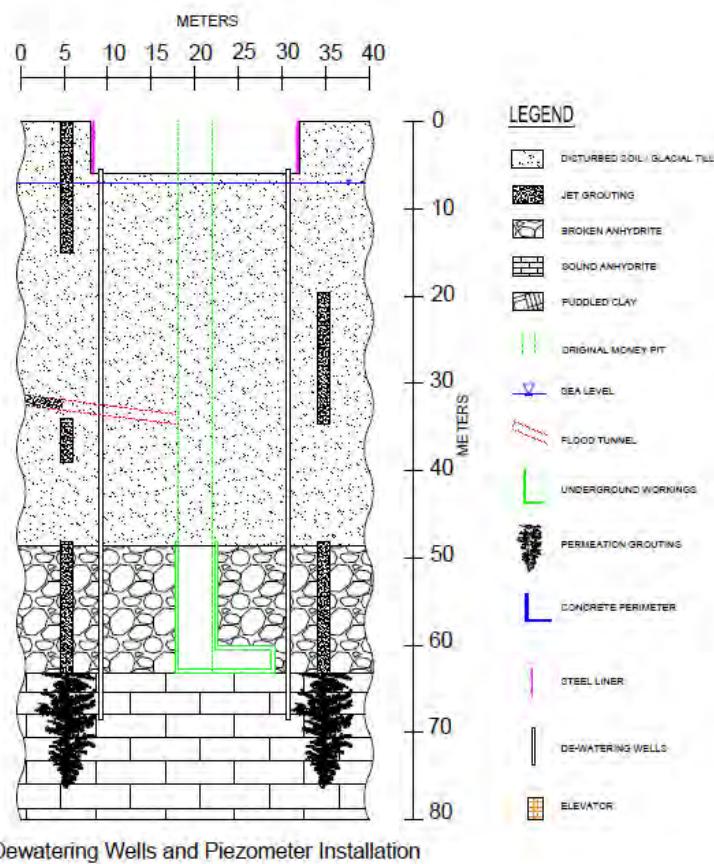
Cross-section of the location of the dewatering wells inside the steel shaft liner
